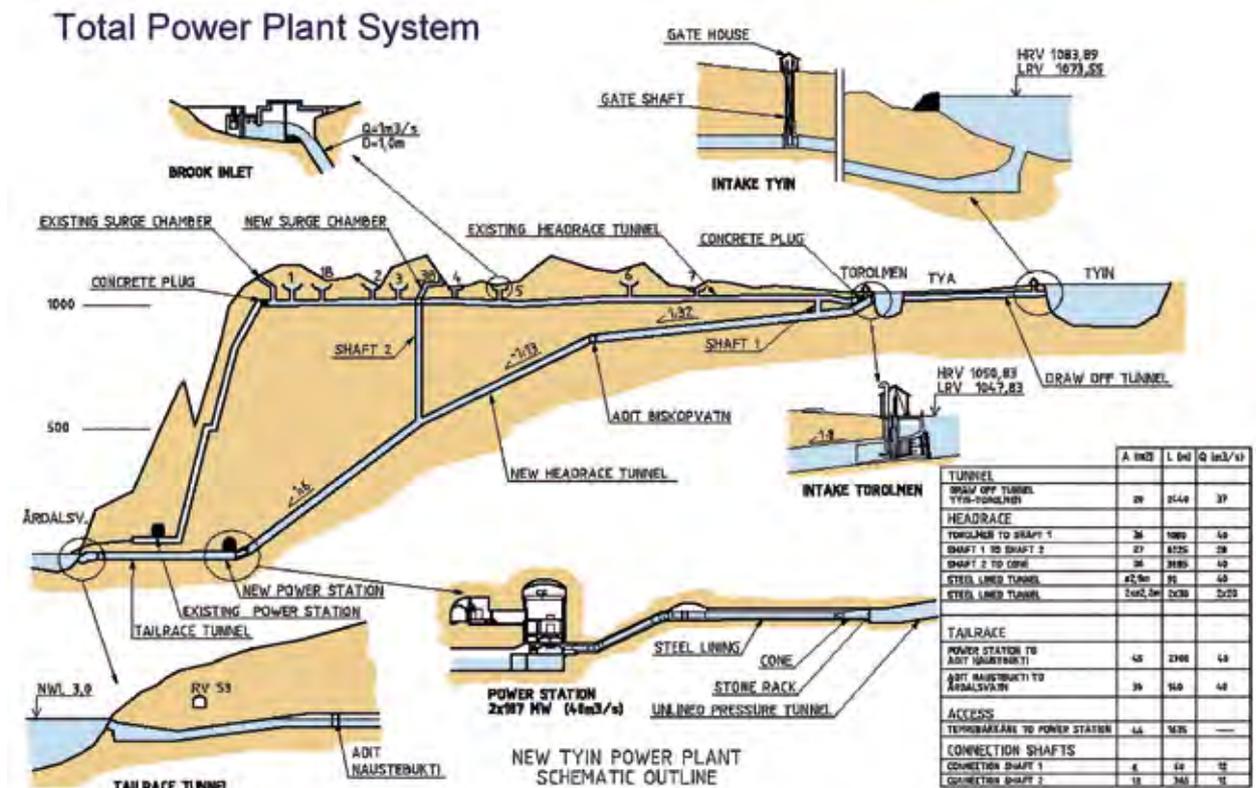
Schematic outline of New Tyin, showing usage of old headrace, integrated into the new Power Plant, connection of old and new tunnel systems, with 400-meter vertical shaft working as connection between old and new headrace, combined with transfer tunnels, brook inlets and as surge chamber
